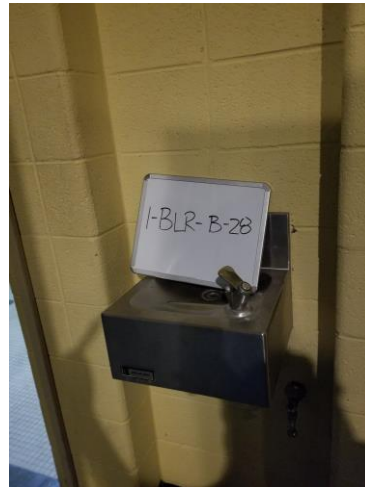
Bubbler, located on the 1st floor in the boys locker room.
